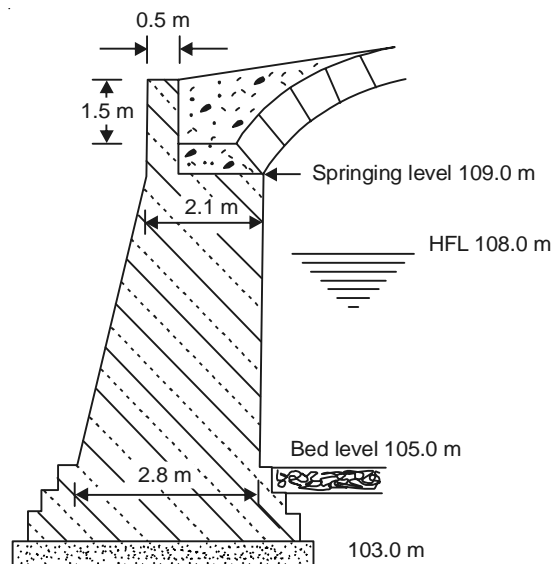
Cross-section of the abutment (Example 5.1).
